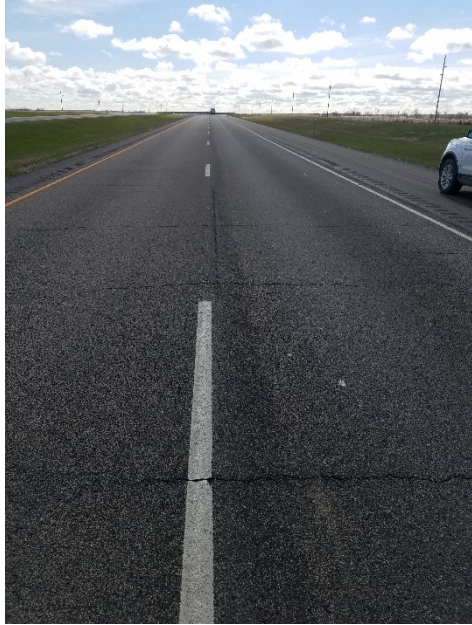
& 10 – Good condition markings at RP 179.0; Typical condition of pavement markings along project corridor (3M AW Elements)
